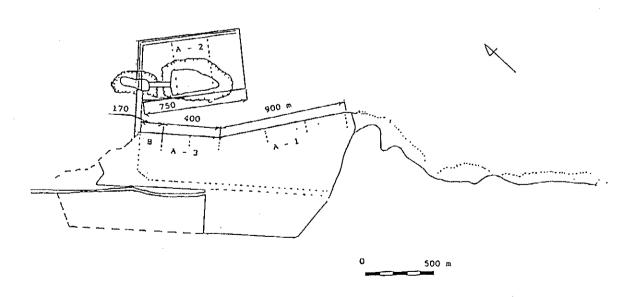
Proposal of Container Terminal Development Plan (2010) (3-2) Tanjung Priok (Jakarta), Alternative 4
